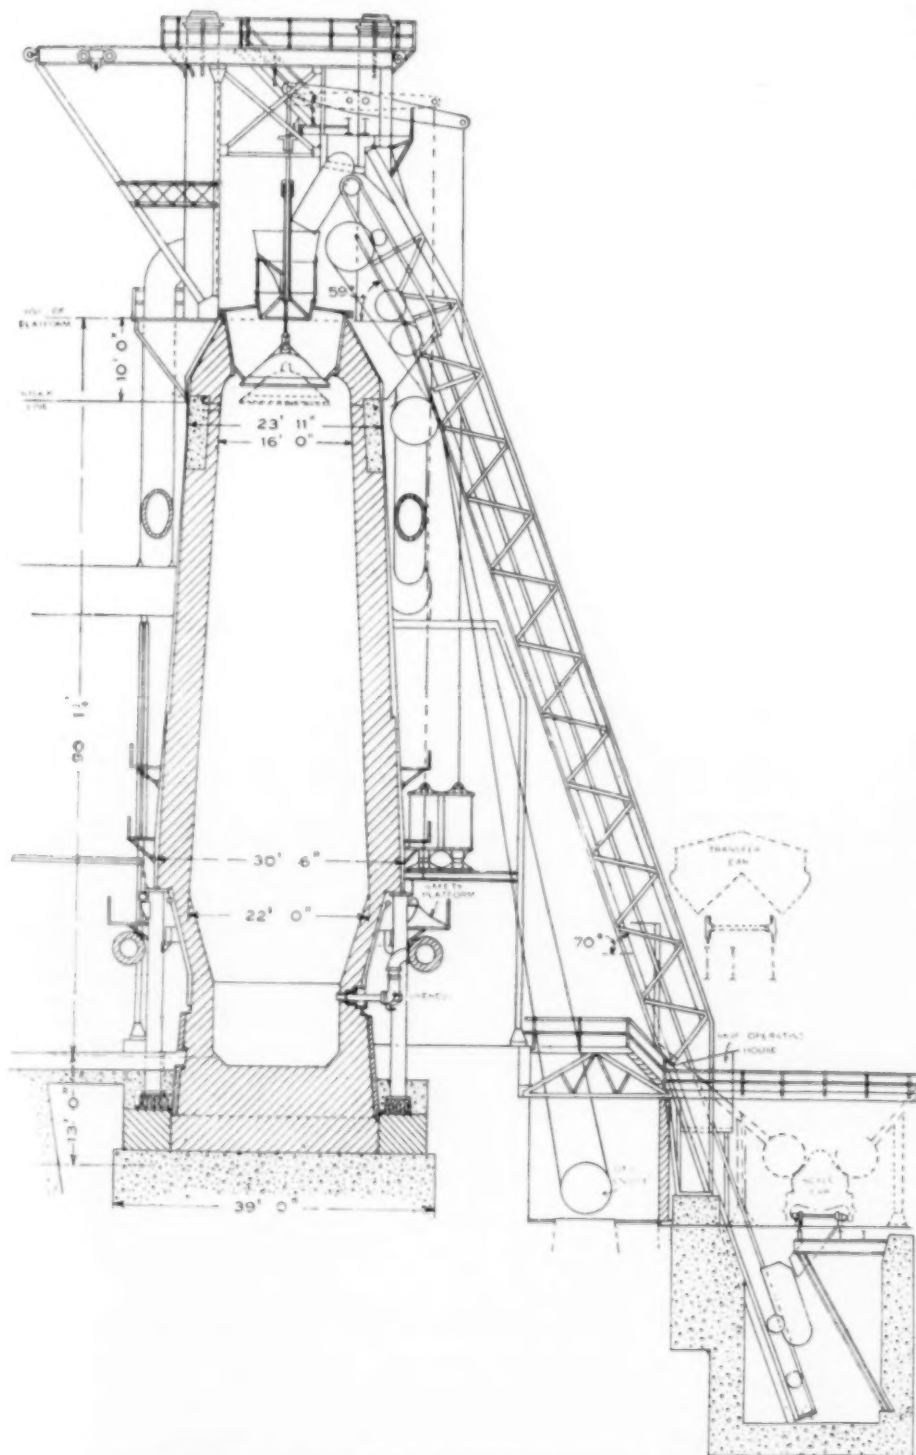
VERTICAL SECTION OF "A" FURNACE, BETHLEHEM STEEL COMPANY
